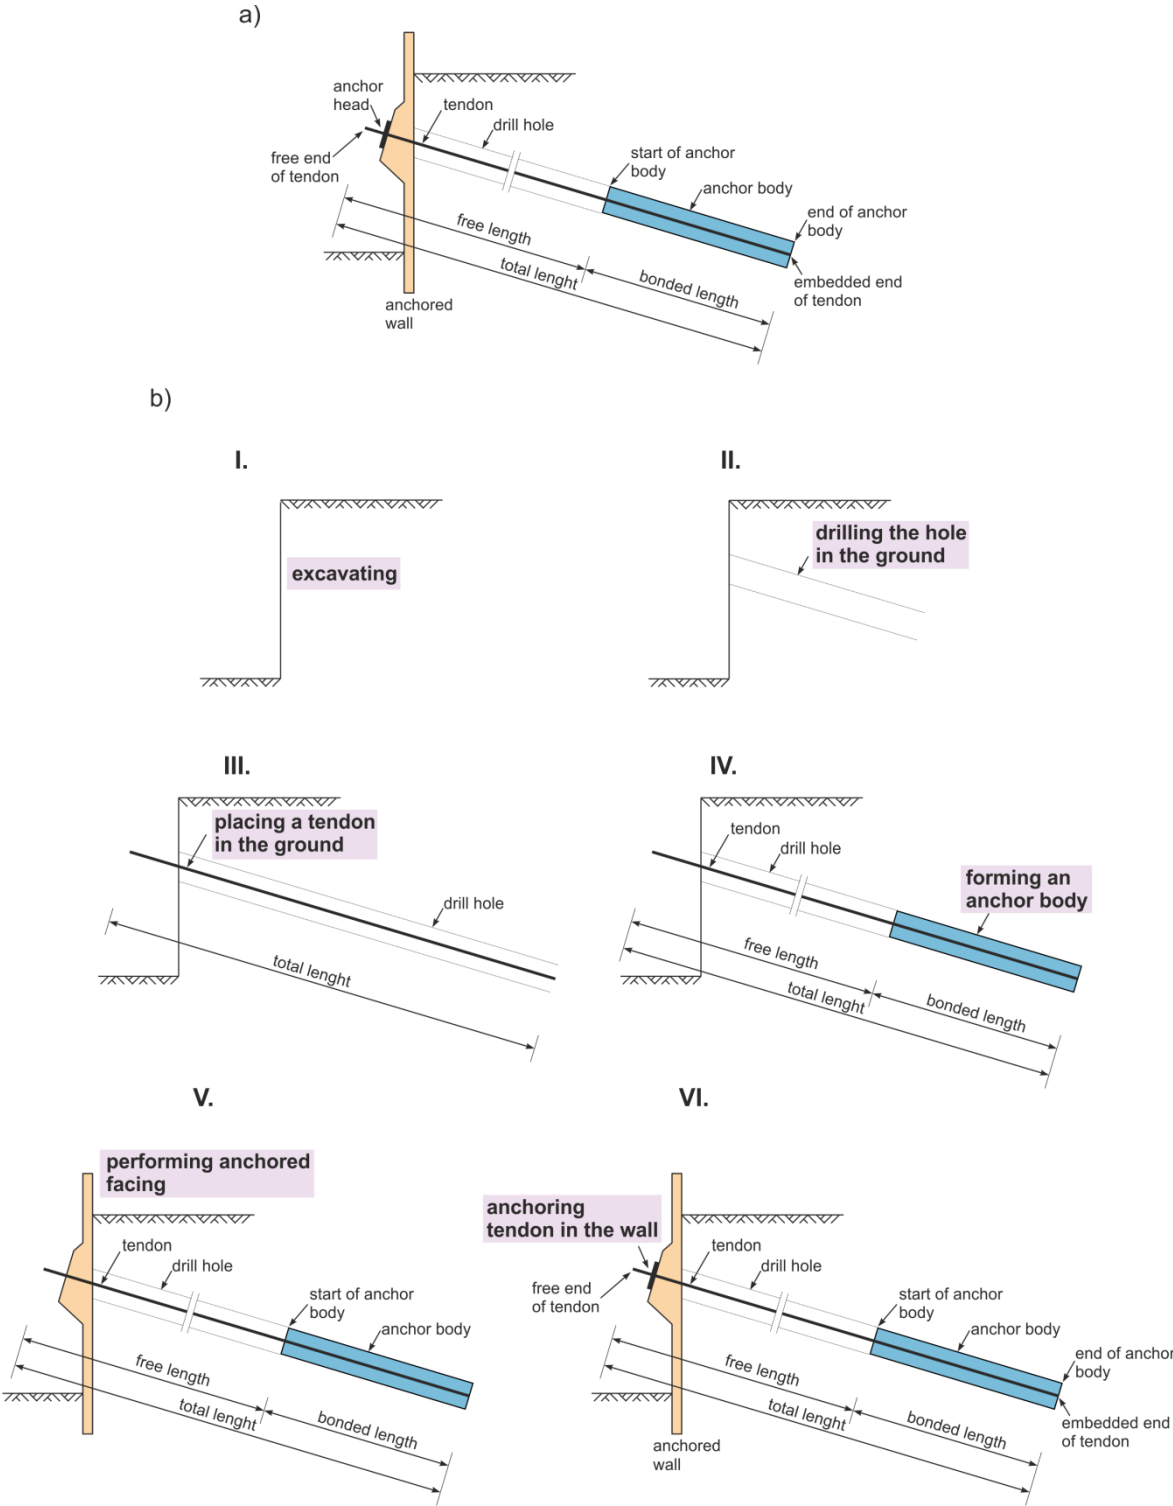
a) Ground anchor, b) process of installation of ground anchor
